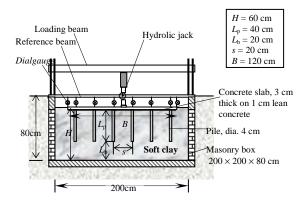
Schematic set-up of loading test on concrete slab supported by piles [8].
